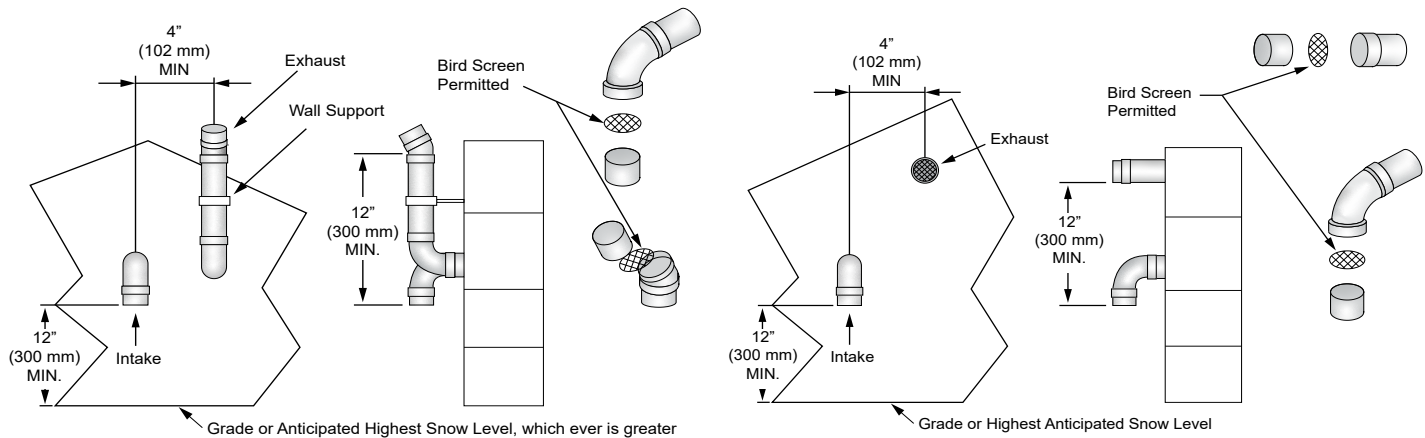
Sidewall Two Pipe Terminal Clearances *Figure 8.9: Sidewall Two Pipe Terminal Clearances, Straight Exhaust
